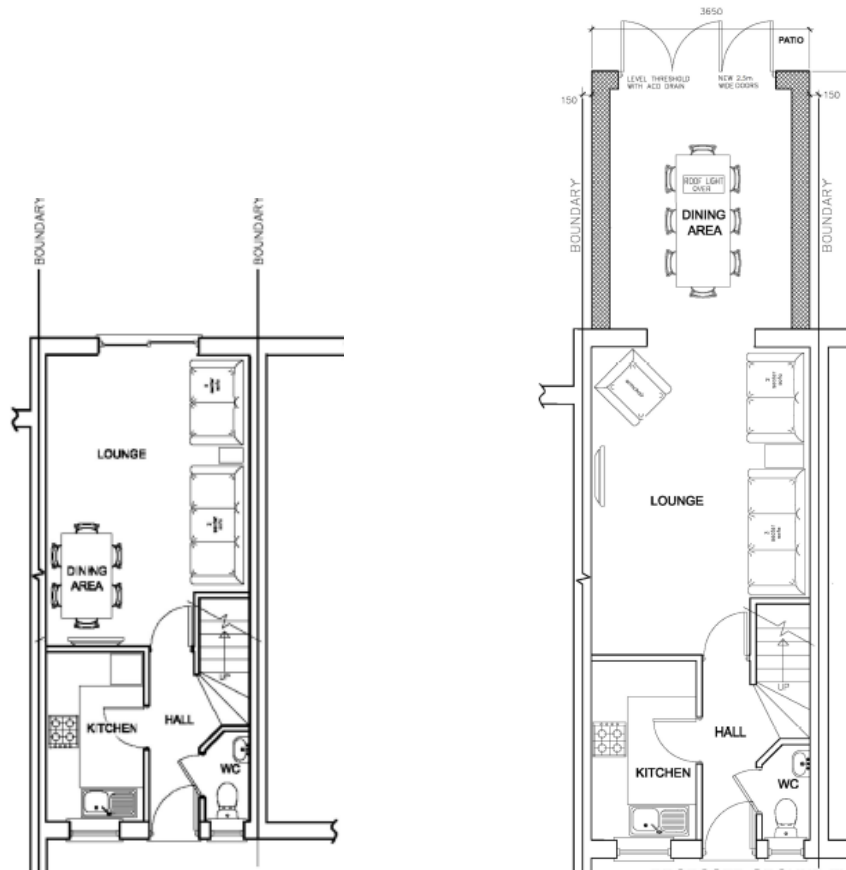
Existing floor plan (left) and proposed floor plan (right)
